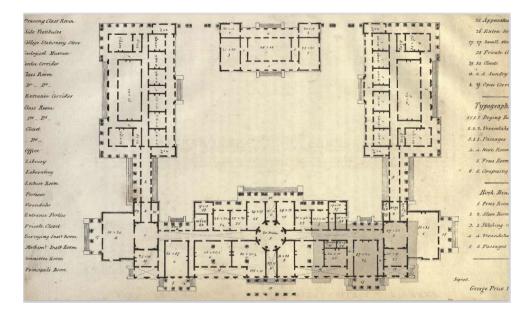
Plan of the new buildings of Roorkee College for Engineers
